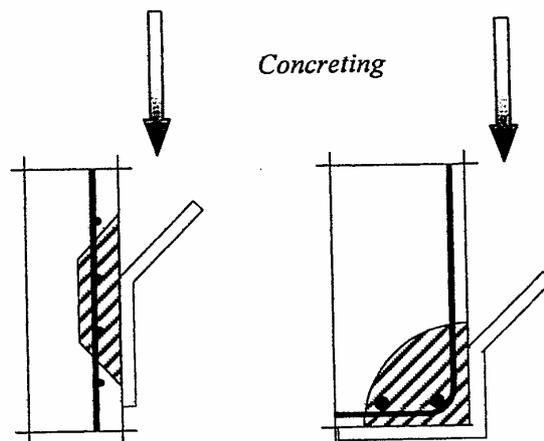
Patch repairs to damaged concrete surfaces
